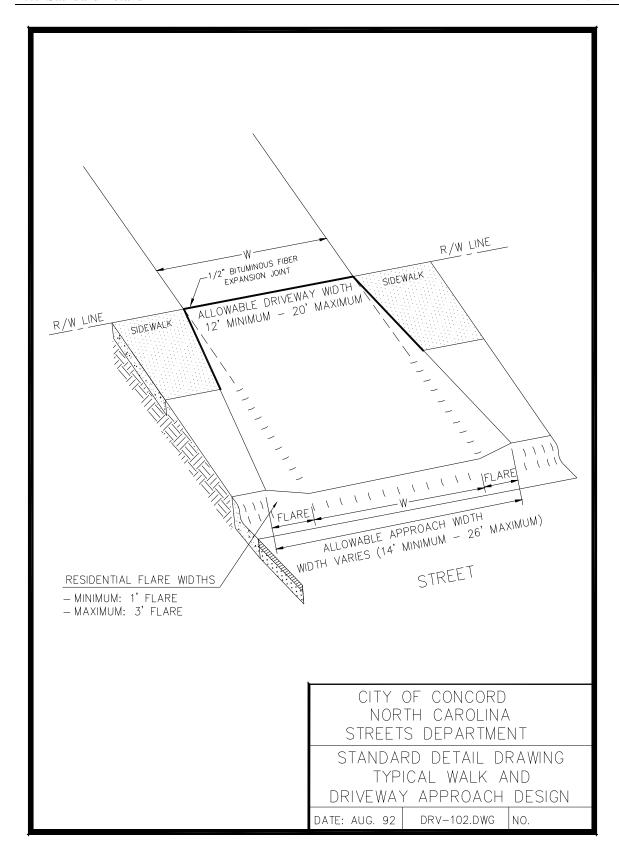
Typical Driveway Approach with Sidewalk Crossing.
